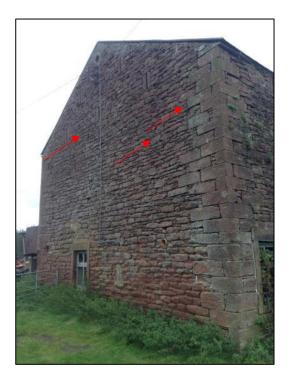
Western elevation of Building 3. Numerous gaps within the stonework across the whole elevation which provide potential access points to roost locations within the stonework (several are indicated with red arrows).
